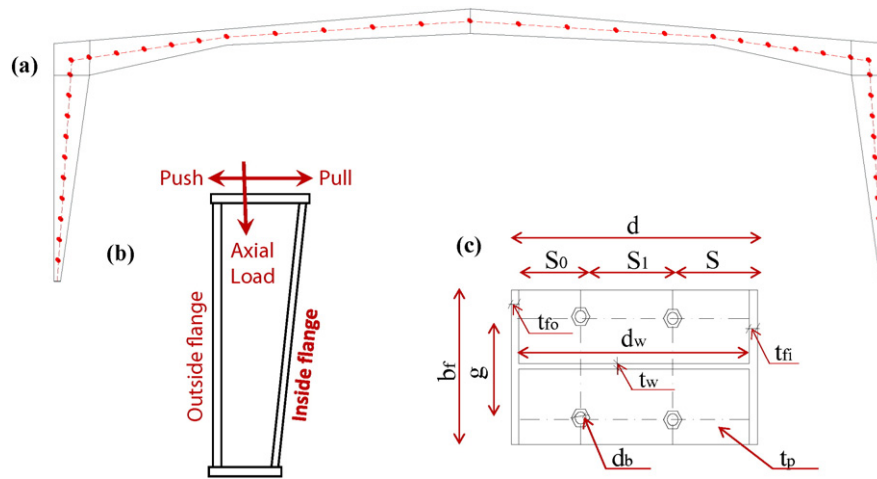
(a) An example gabled frame used in low-rise metal building construction, (b) elevation view of the column stub, (c) base-plate connection details.
